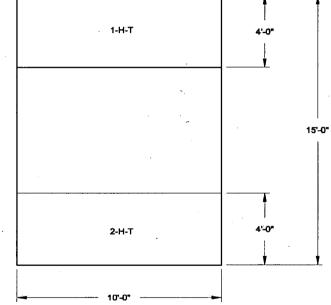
H.6-208: WALL 16 LOOKING FROM OUTSIDE TRANSVERSE REINFORCEMENT ZONES
